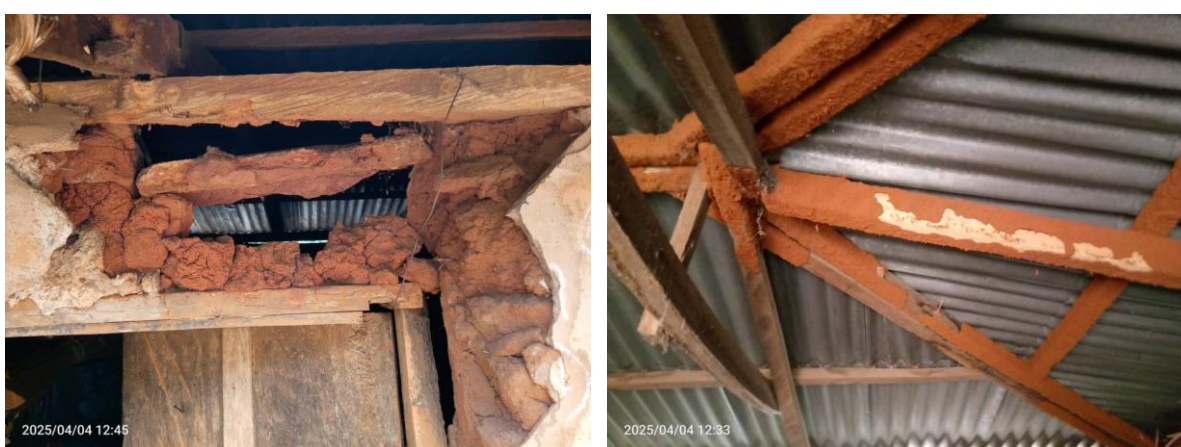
Collapsed ceiling in a residential apartment in Ogbadigbo.
